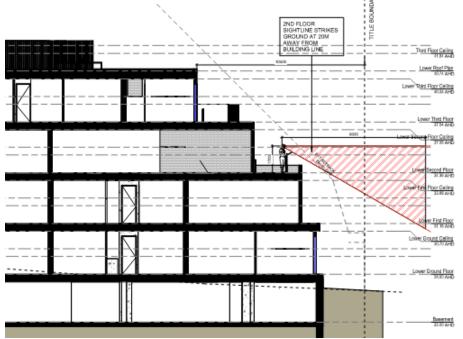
Sectional diagram demonstrating overlooking measures from second floor terrace, toward the rear
